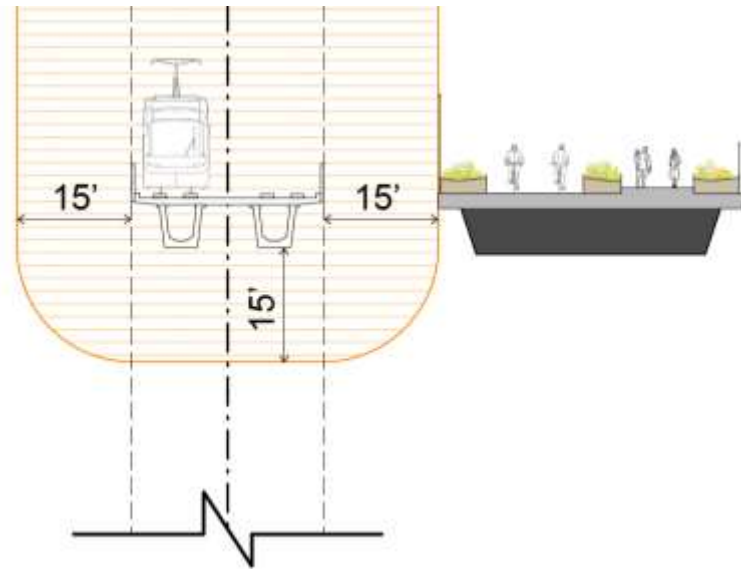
Section showing potential bridge location and required gateway setbacks at I-405.
